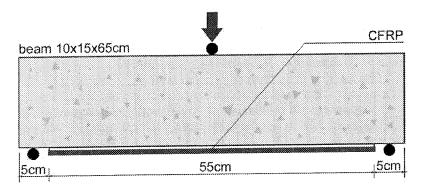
Flexural test: reinforced concrete beam strengthened with CFRP.
